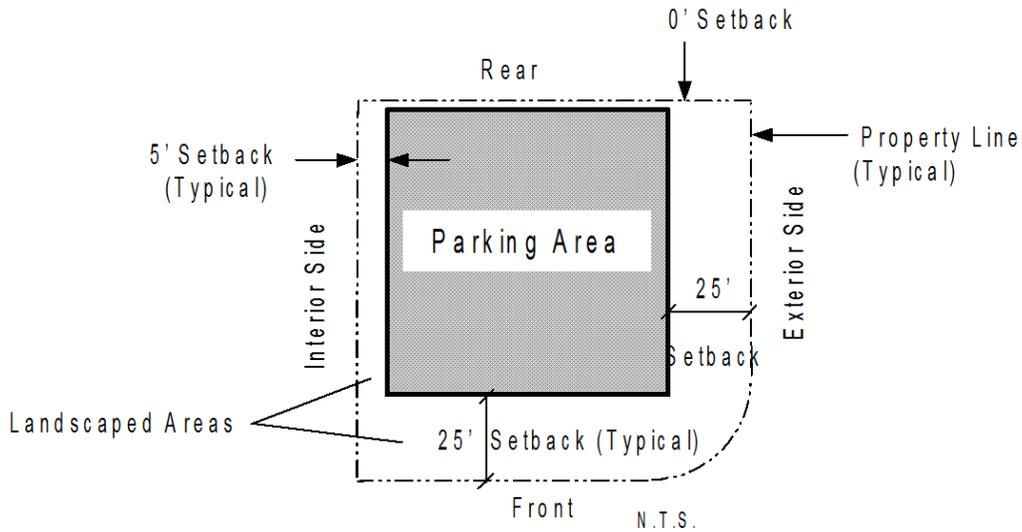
CORNER PARCEL – PARKING AND LANDSCAPE SETBACK
